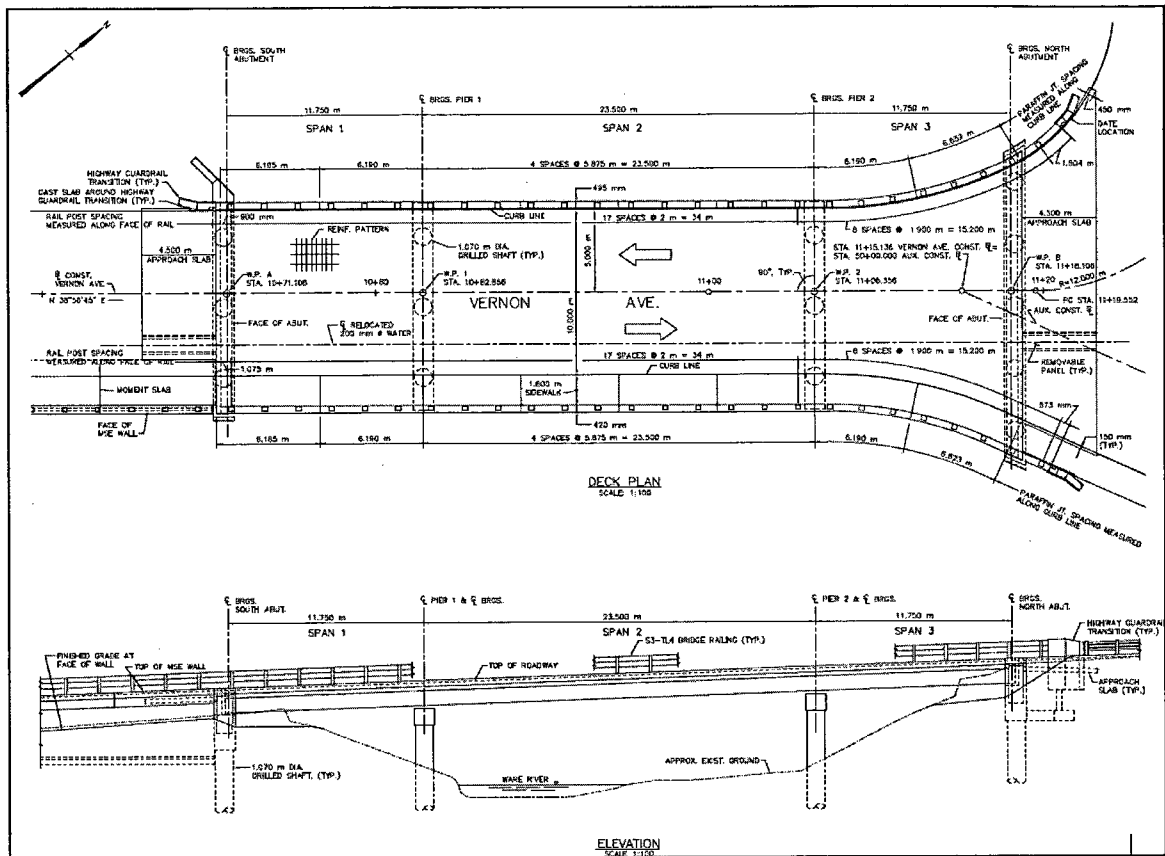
Plan and elevation views of the VAB (FST, 2007)
